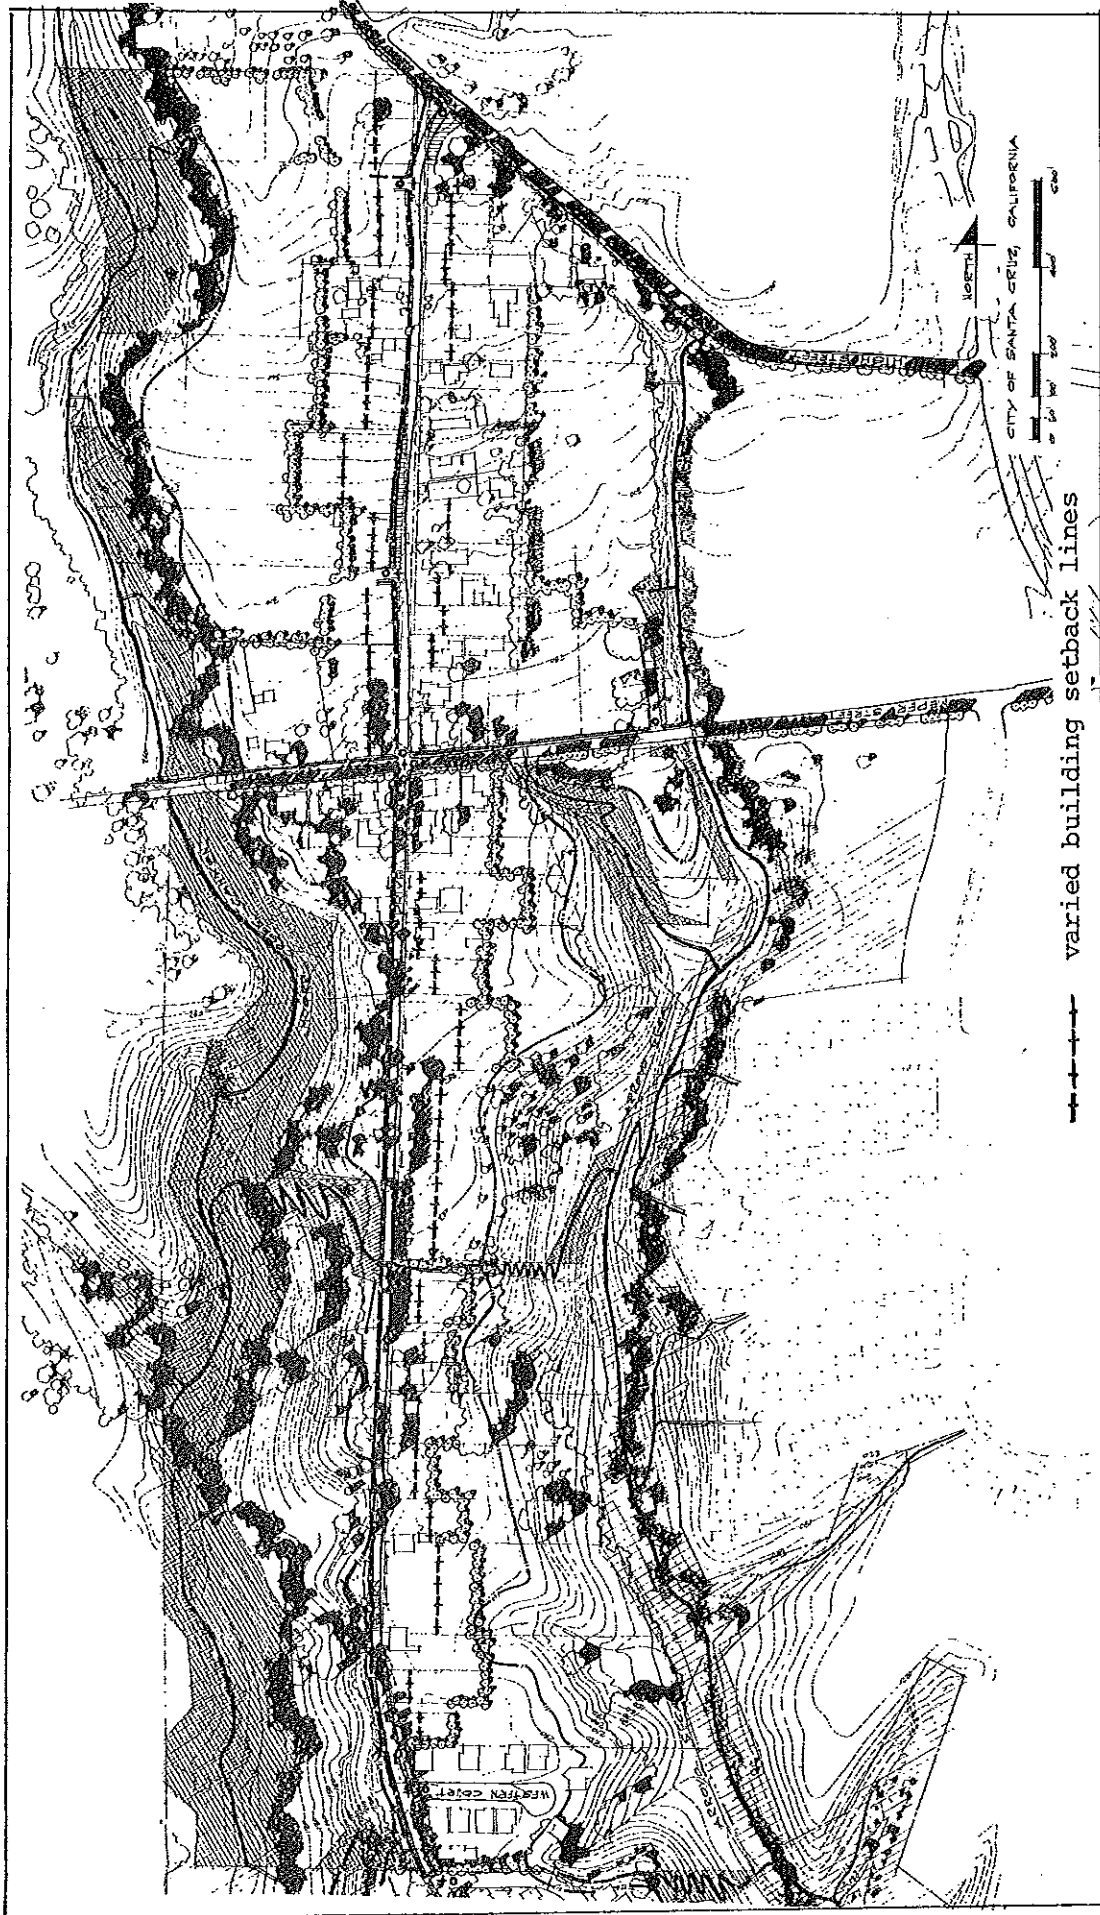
TYPICAL VARIED BUILDING SETBACK LINES
